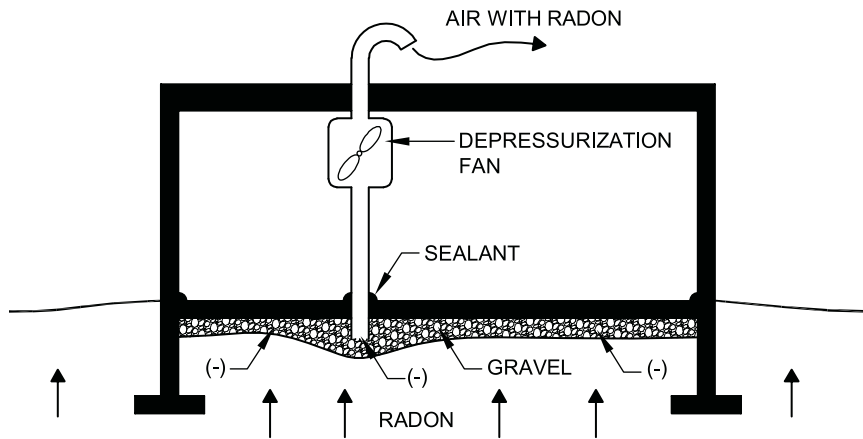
When radon is expected or found to be present, any or all of the following should be performed: all slab penetrations should be sealed particularly well, the building's mechanical equipment should be run at a positive pressure, and the under-slab gravel should be depressurized.
